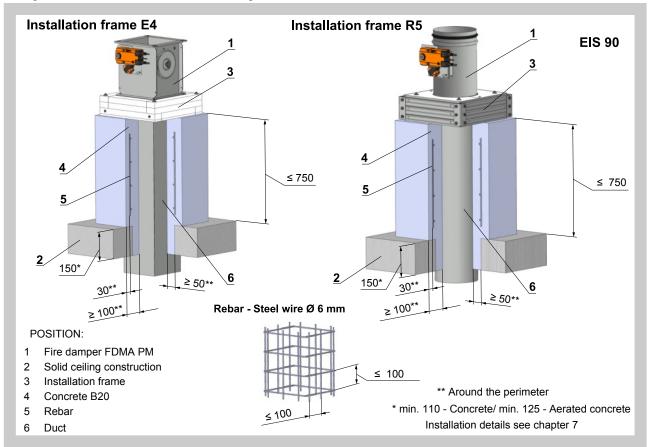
Installation outside of solid ceiling construction - concrete and installation frame E4, R5
